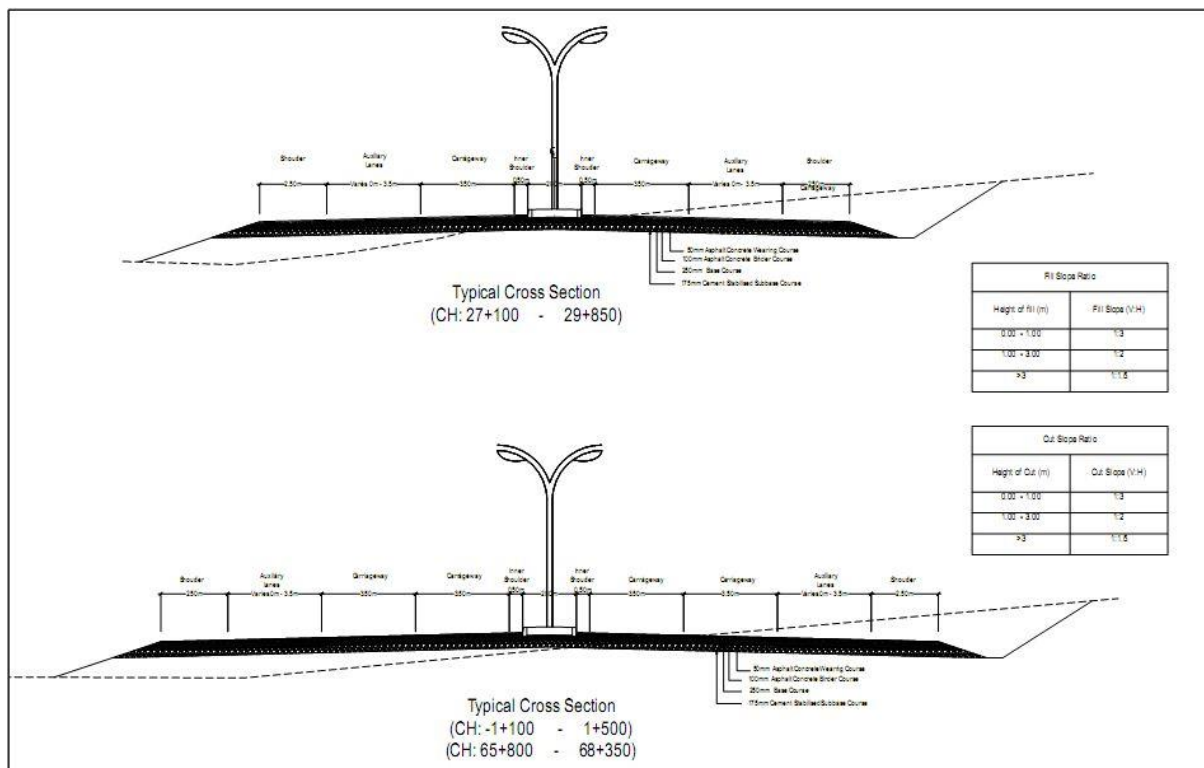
Sample Road Plan and Profile for Sections 1 and 3 Project Roads
